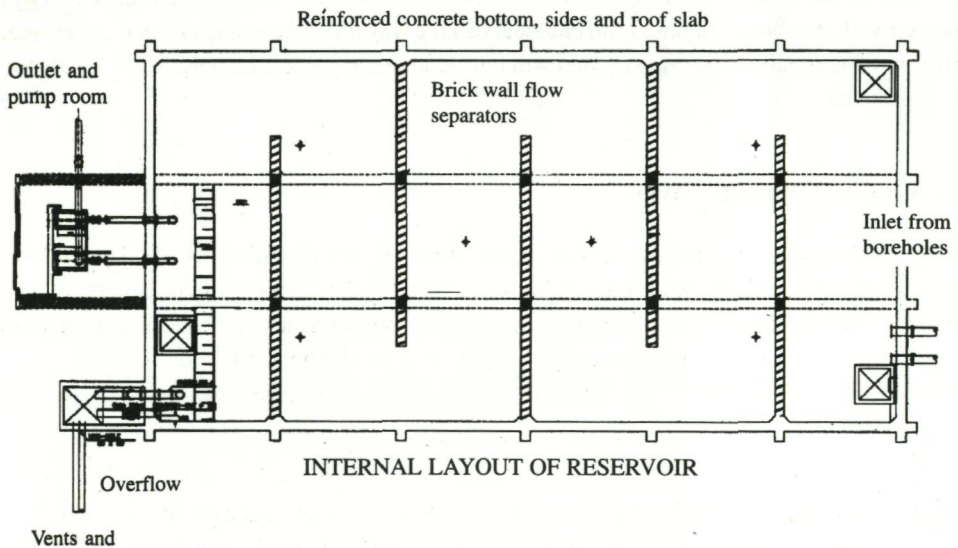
TYPICAL REINFORCED CONCRETE RESERVOIR
